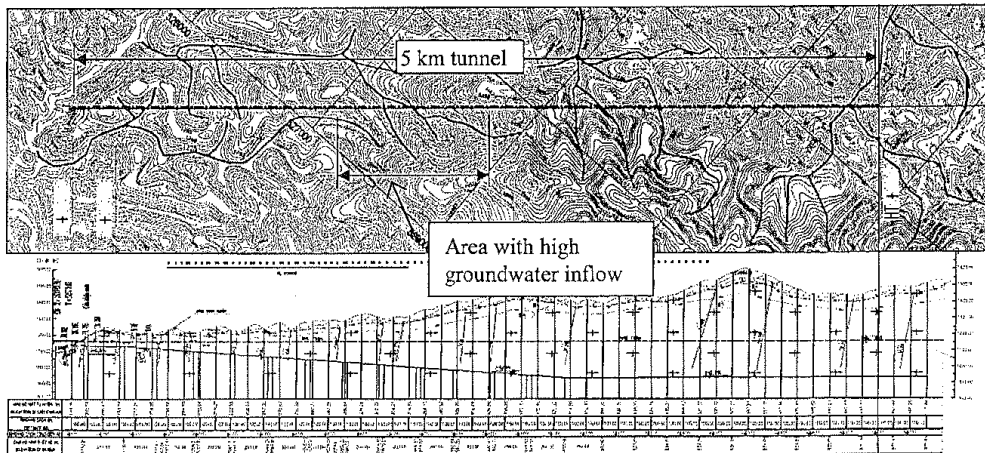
Plan and longitudinal section – The 5 km drill and blast tunnel from the intake.
